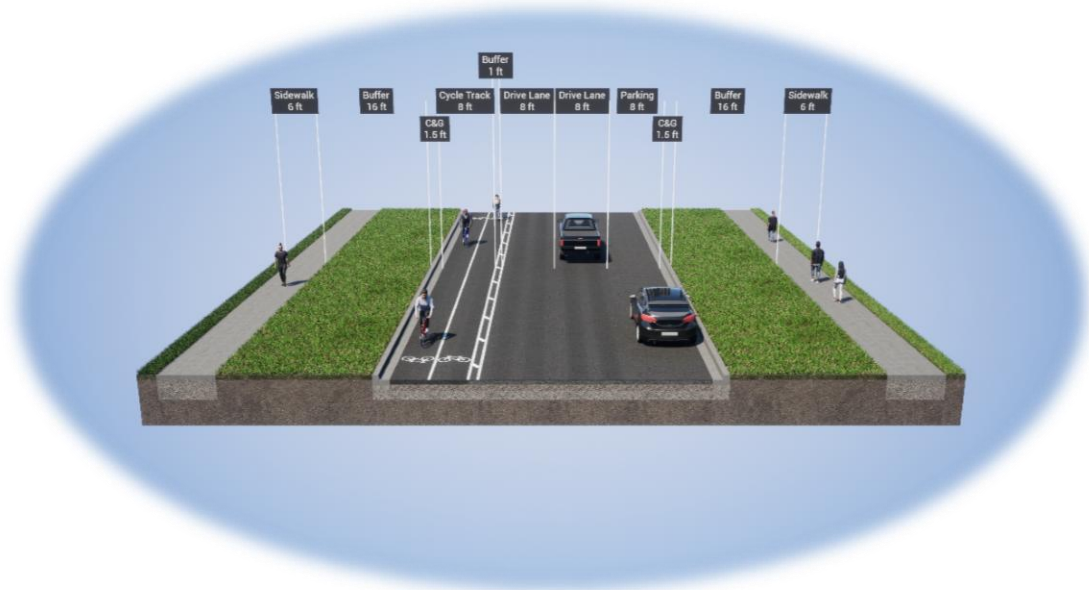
Existing 9<sup>th</sup> Street Cross Section from Ute Ave to Gunnison Ave
